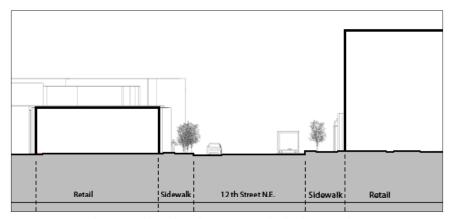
A-A Typical Section through 12th Street Corridor looking north
